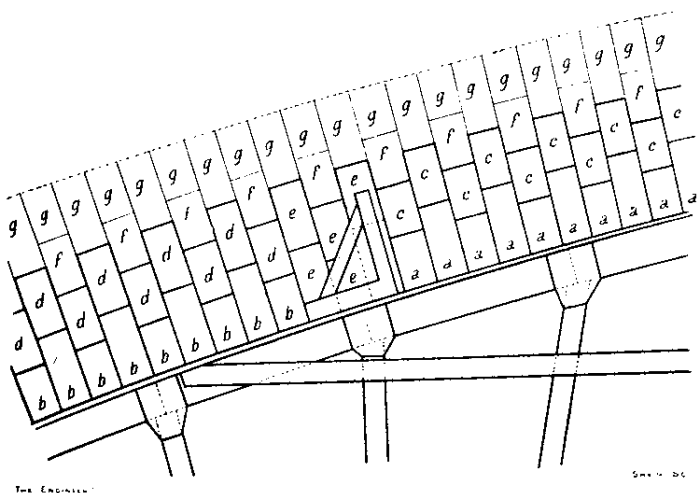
THUR BRIDGE No. 1.—METHOD OF LAYING MASONRY
